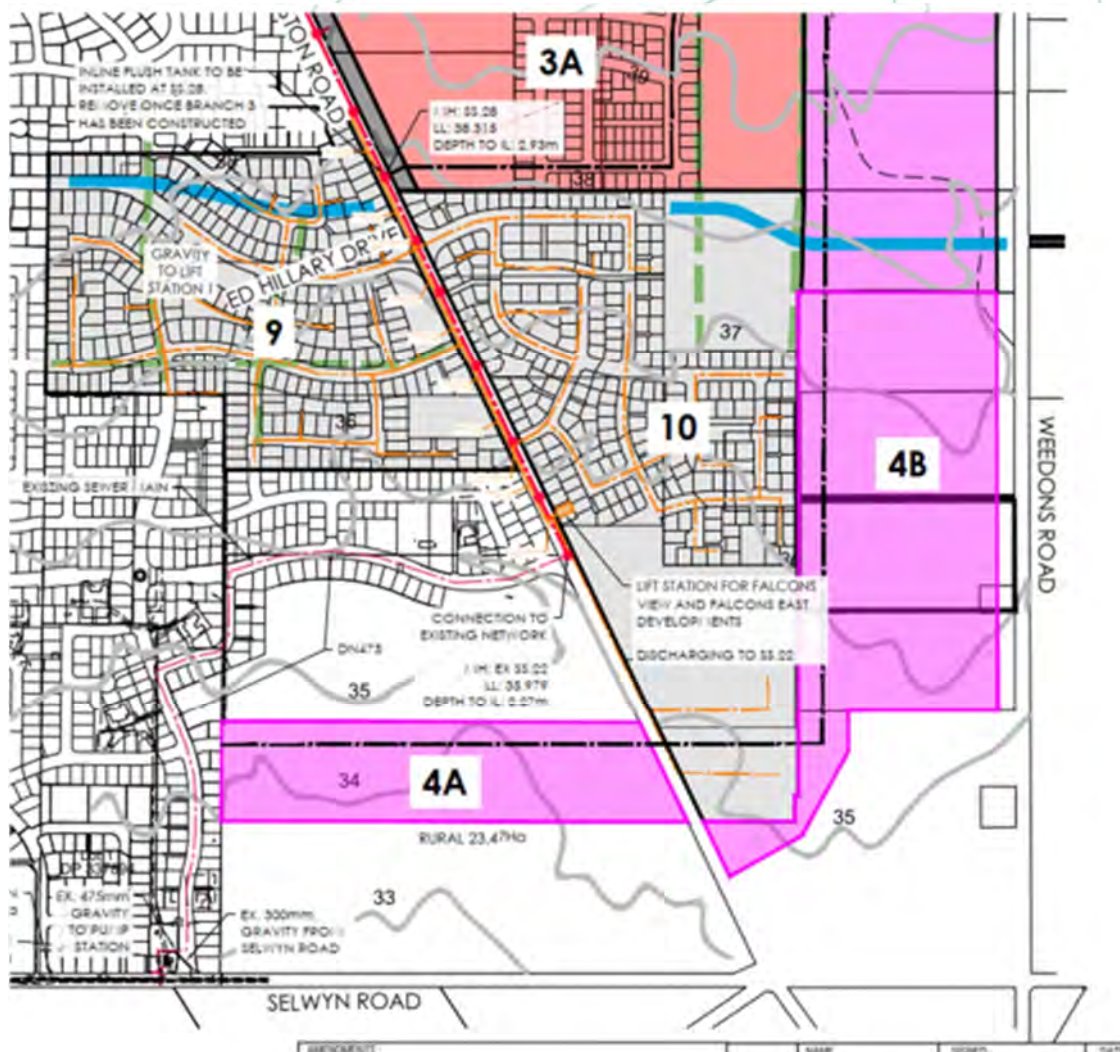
Overall Catchment Plan for proposed new SE Pump Station
